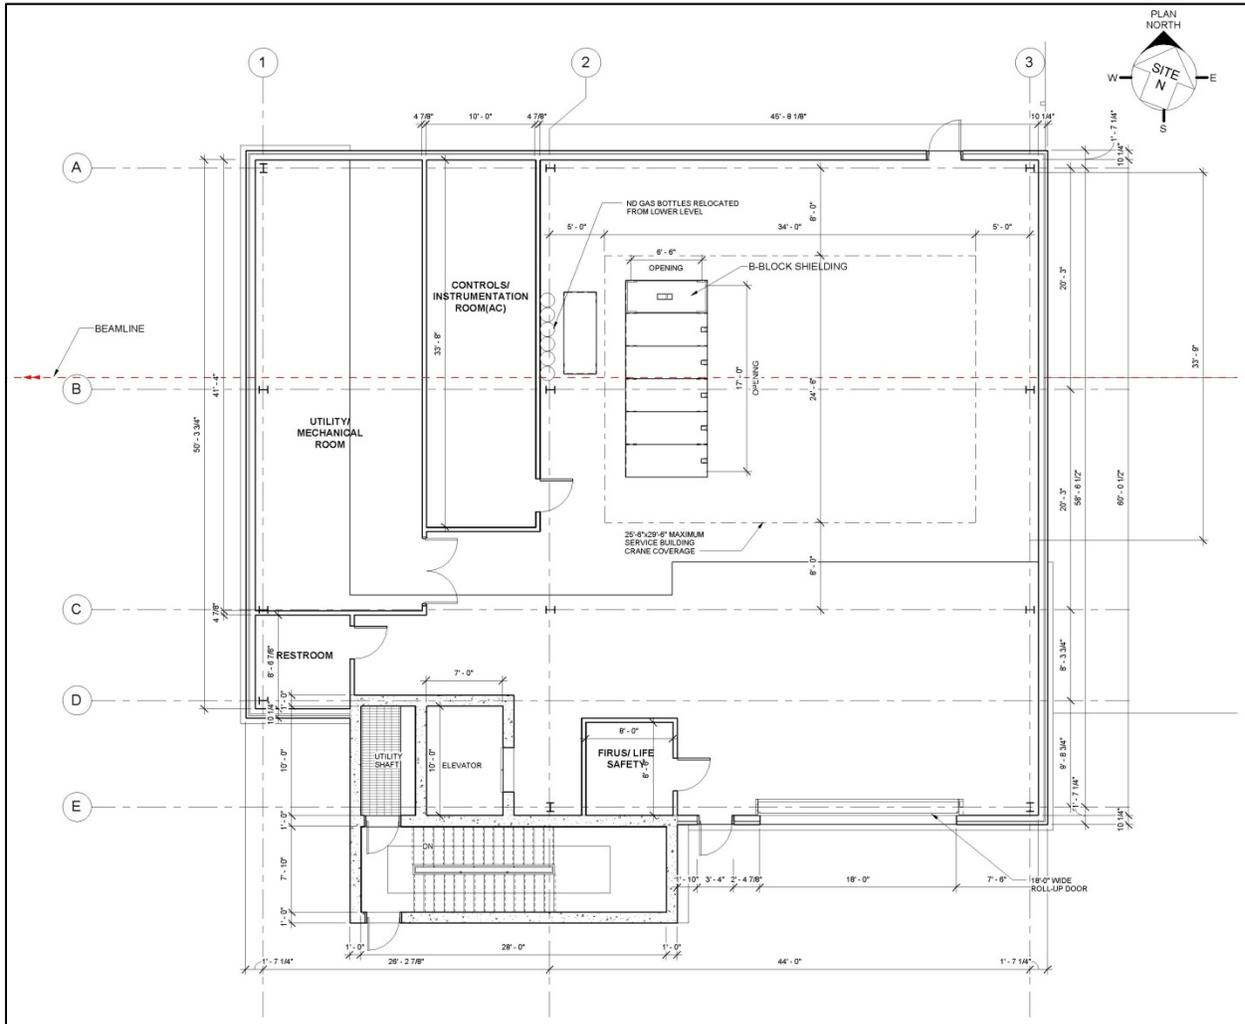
Absorber Service Building (LBNF-30) Floor Plan
